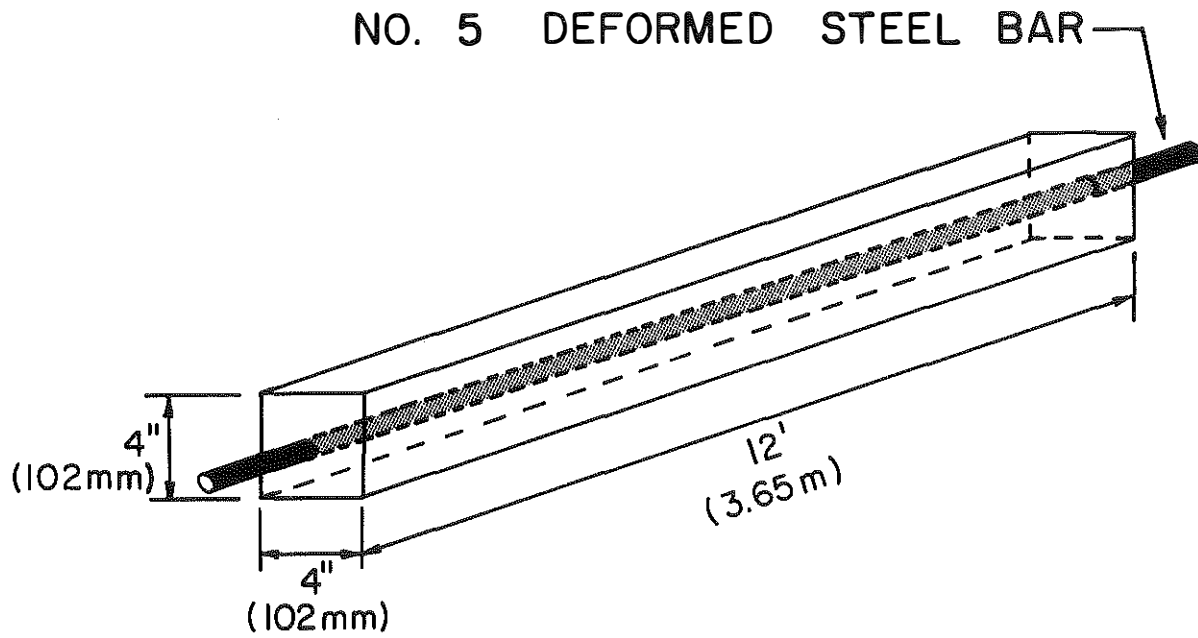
Test Specimen; Beam Used to Simulate Cracking Conditions in Reinforced Concrete.
